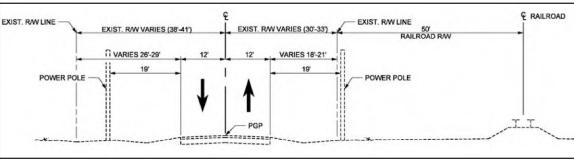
Existing Typical Section (West of Dora Avenue to Merry Road)
